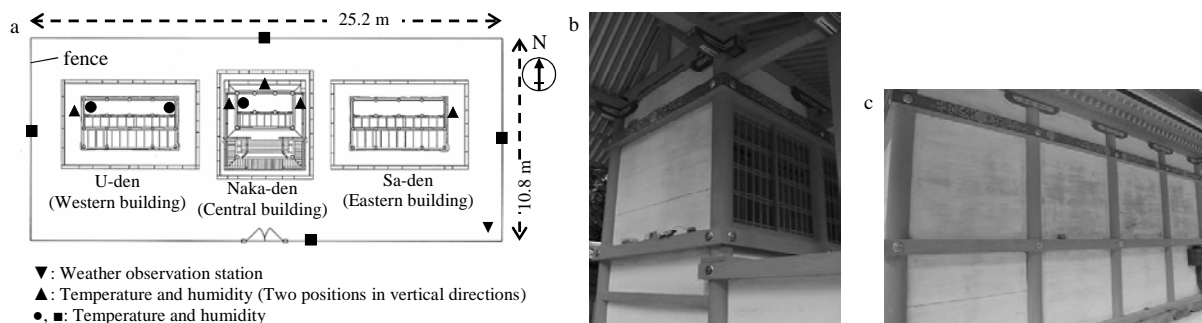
(a) Plan of the Kusyo myojin and location of the measurement devices; (b) west wall of the western building; (c) north wall of the western building.
